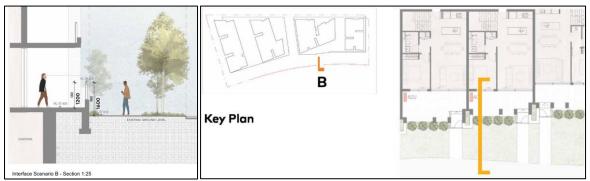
Proposed Street Interface Scenario B along the eastern Serviceway.
